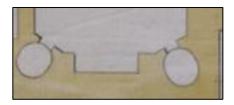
Extract from the 1780s plan, recording position of fireplace and probable flanking bread ovens
